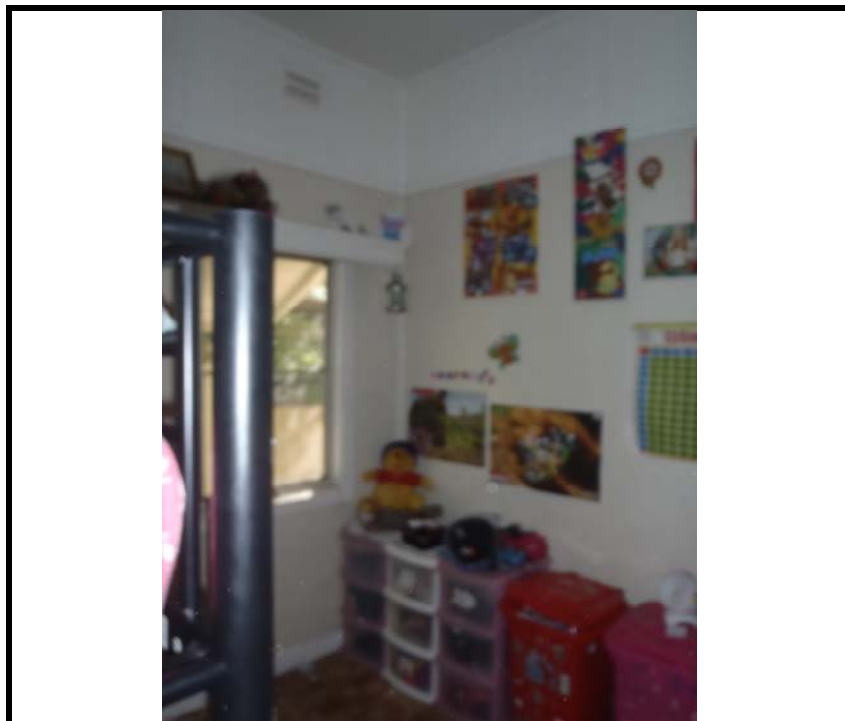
ACM sheeting used in the walls and ceiling to the children's bedroom at 1McLeod Road.
